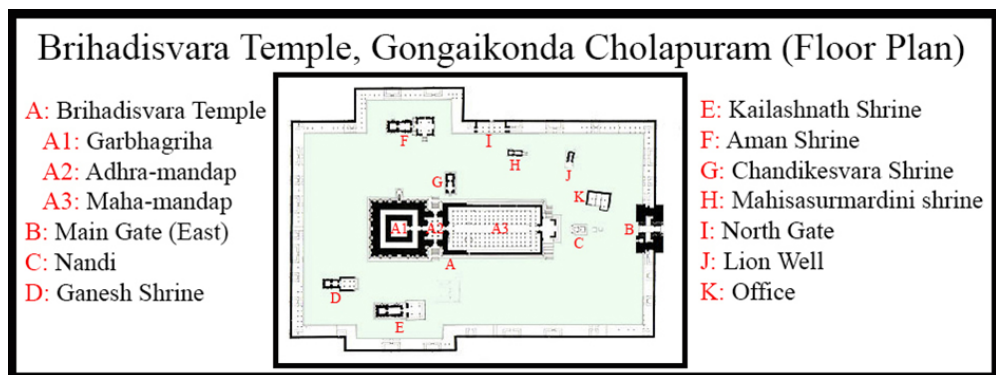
Floor plan of Brihadeshwara Temple, Brihadeshwara Temple, Gangaikonda Cholapuram
